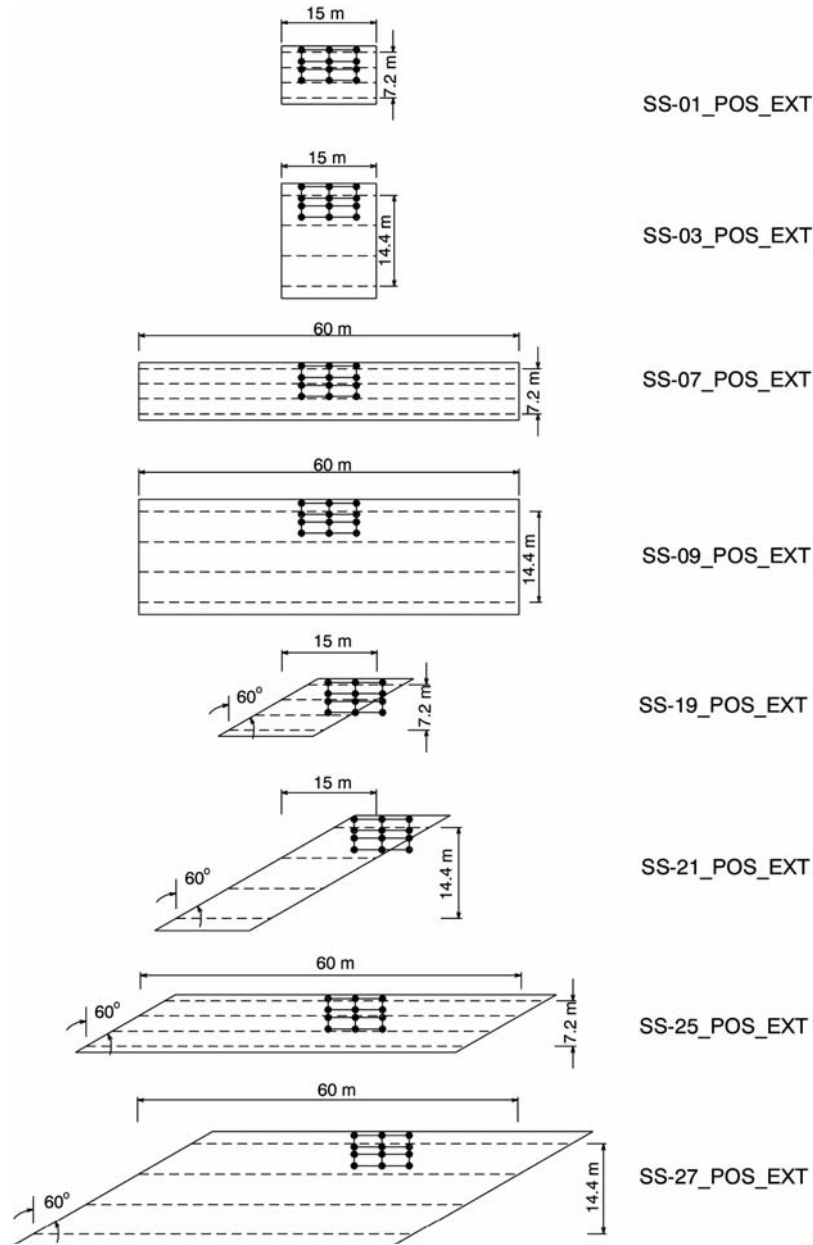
HL-93 truck configurations, simple span, exterior girder, positive moment.
